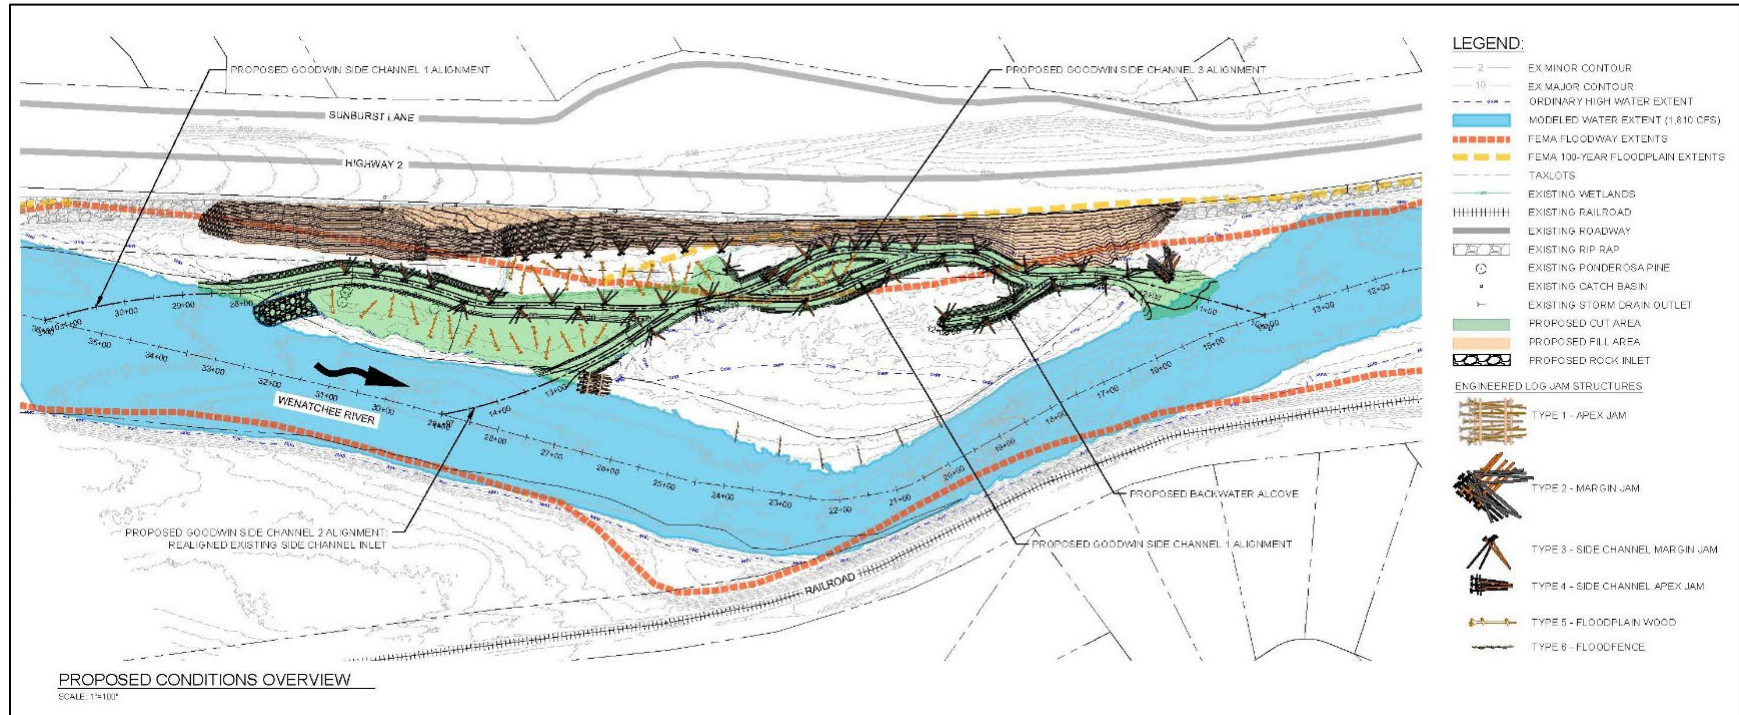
Excerpt of the current restoration design (60%) plan (see Appendix 1 for detailed design sheets).
